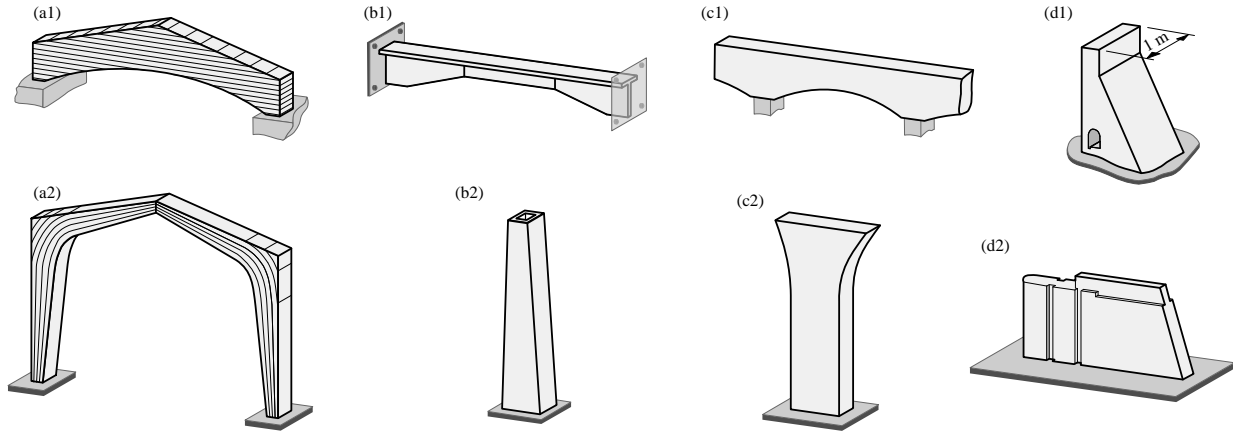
Structural elements with variable sections made of (a) wood, (b) steel, and (c) reinforced concrete; (d1) unit slice of a concrete dam, and (d2) spillway pier.
